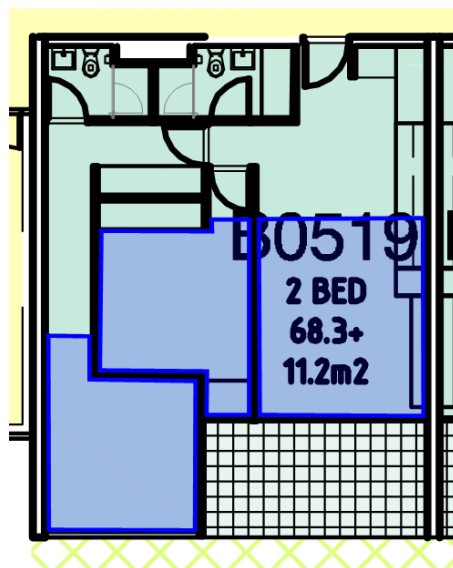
NATURAL VENTILATION ZONES AND OPENINGS – TYPICAL 2 BED APARTMENT
